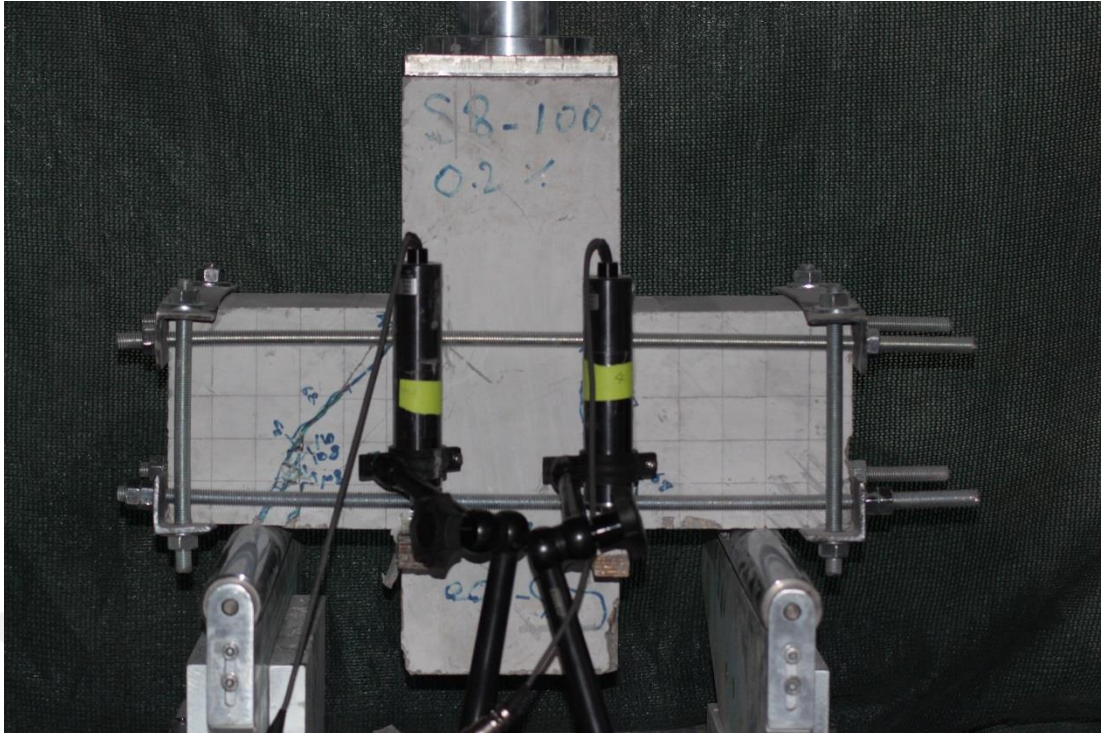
(Specimen S8 - 100 - 0.2%) in the test machine
